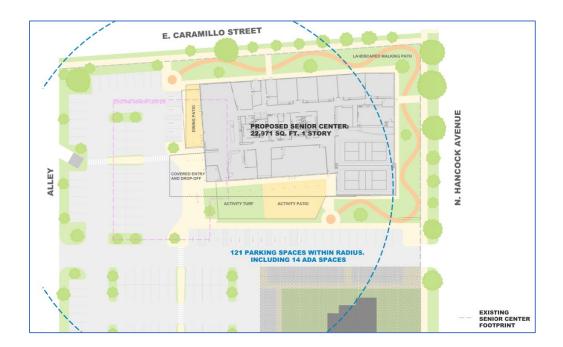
Proposed site plan for Colorado Springs Senior Center.
